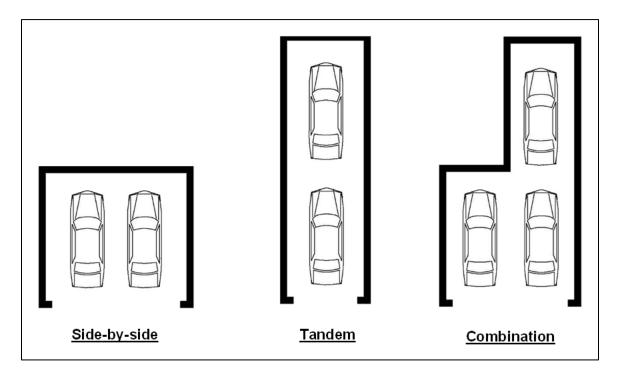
A - Townhouse Dwelling Garage Parking Arrangements
